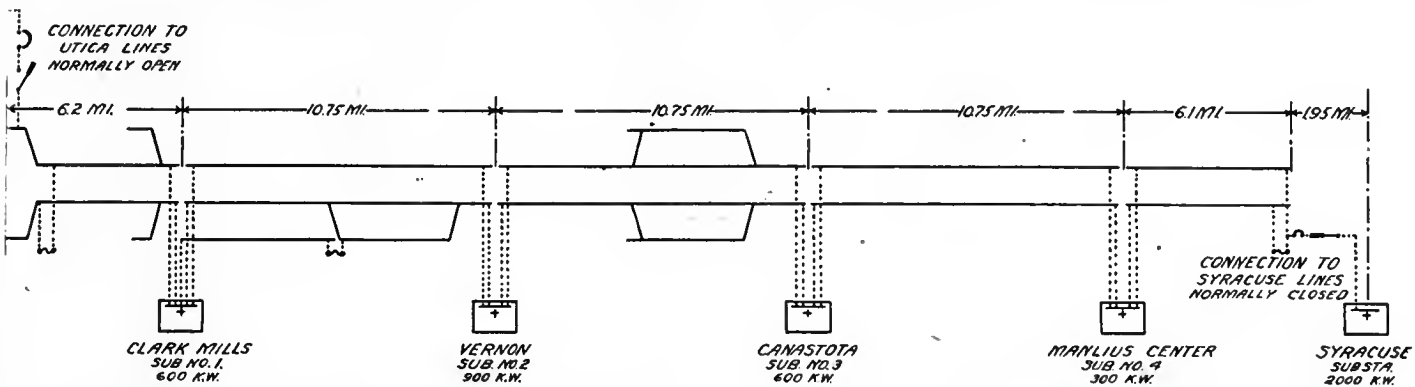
LOCATION OF SUBSTATIONS AND THIRD-RAIL LAYOUT ON THE ONEIDA LINE, NEW YORK STATE RAILWAYS
